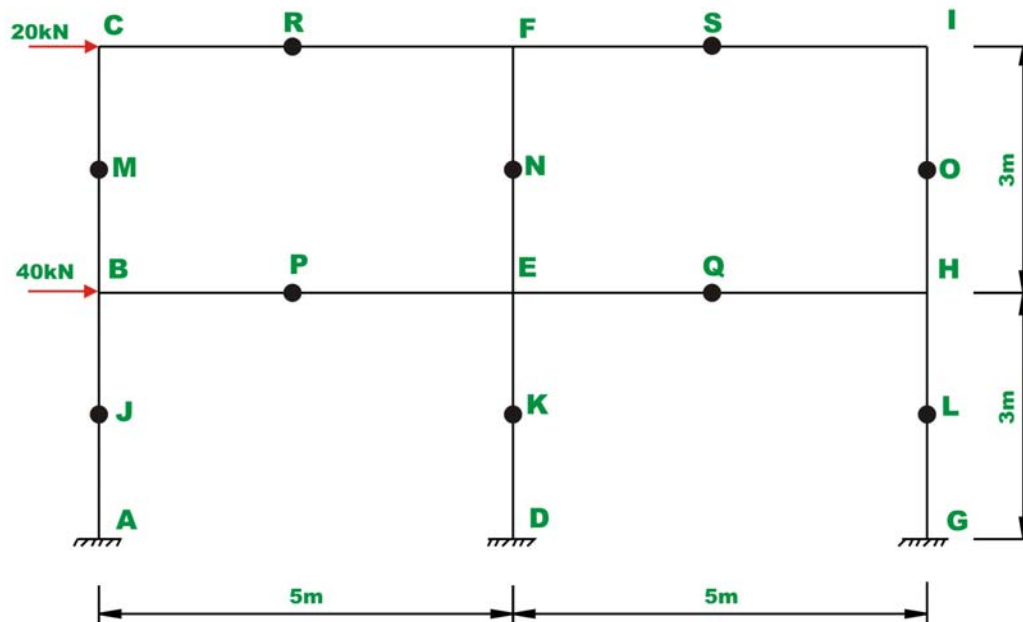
Two storey building frame subjected to lateral load of Example 36.2
